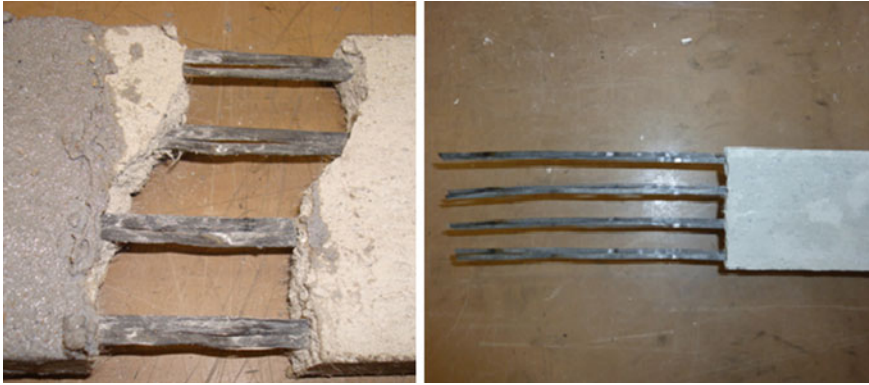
Particulars of carbon FRCM specimens after failure
